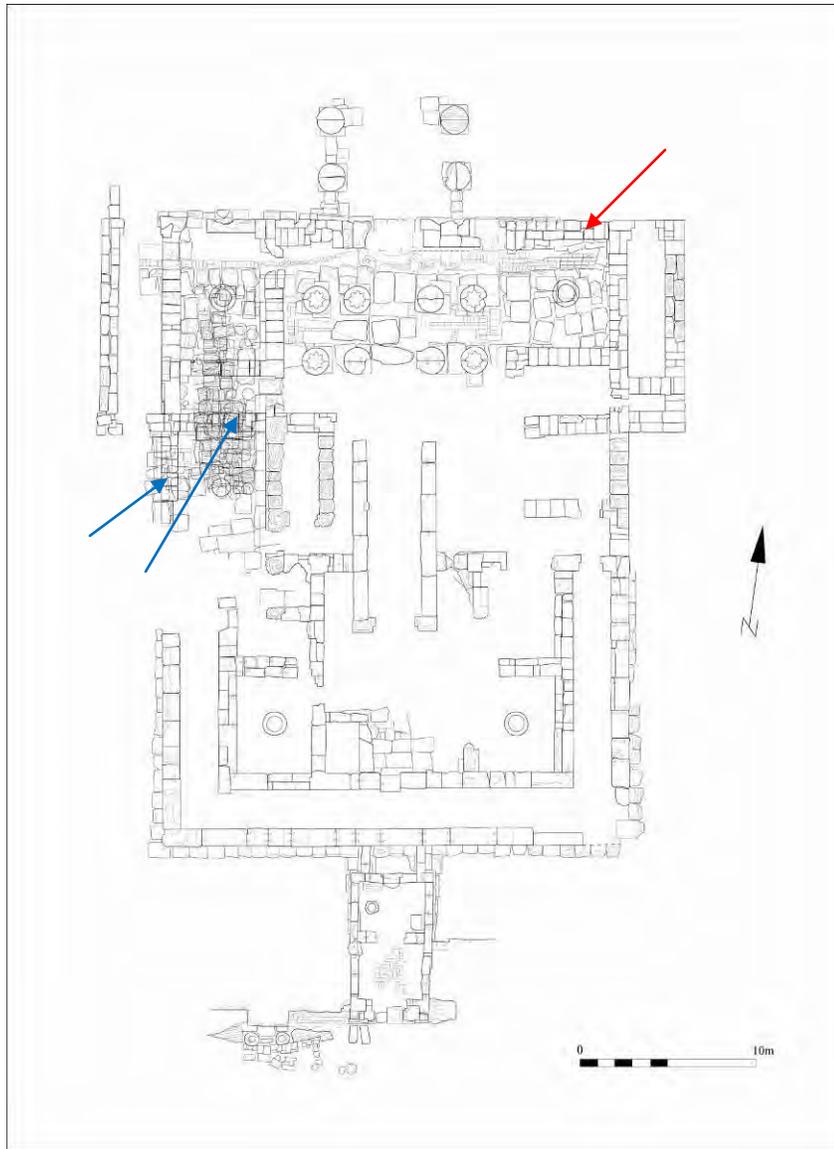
Mut Temple with red arrow indicating east end of North Porch. Dismantled and rebuilt 2008-09. On west are walls dismantled and now rebuilt indicated with blue arrows. Note column drums shown beneath. This is the area where the columned Porch/Hall of Drunkenness once stood.
